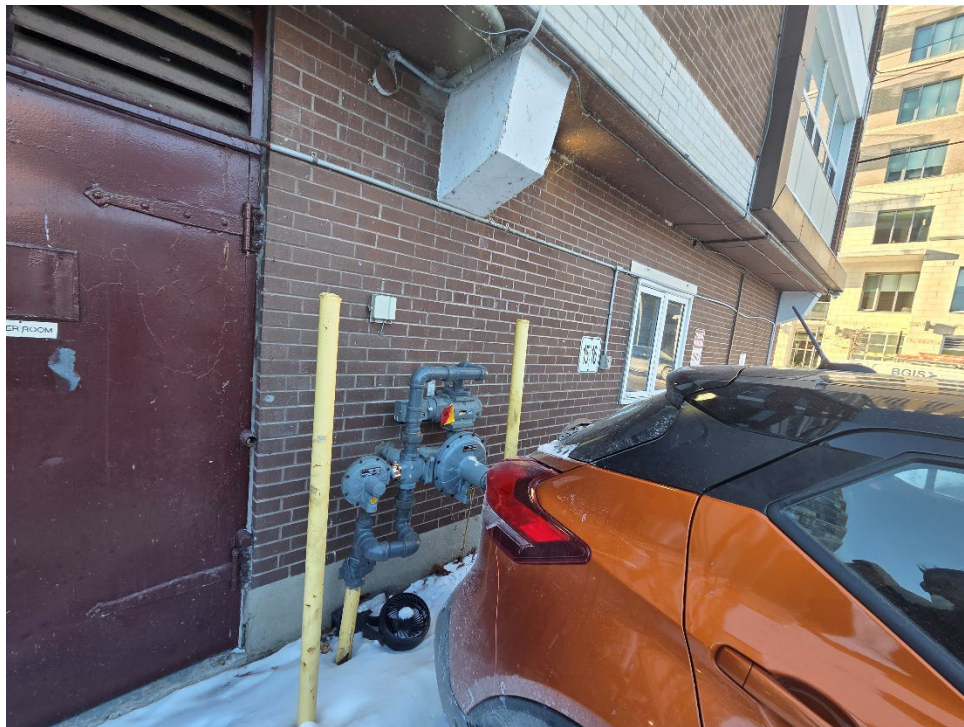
View of the of the northeast portion of the Phase One Property looking southwest. View shows the vacant residential rooming house building at 122 Forward Avenue.
